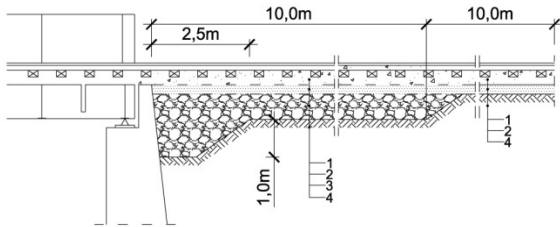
Longitudinal section through a stiffening layer in the transition zone of a railway track - bridge structure made of stone material [13]: 1 - ballast, 2 - wedge 0.15 m (closing layer), 3 - broken stone pitch 0.60 m, 4 - embankment ground (subgrade)
